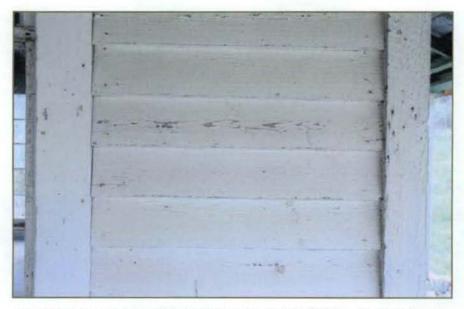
House, View #15, East Façade, Detail of Siding, Camera Facing West
